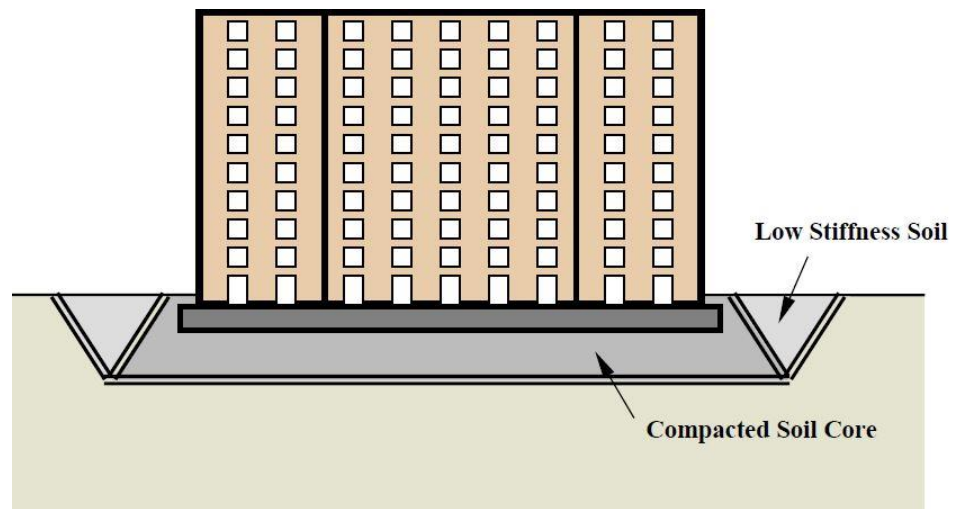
Schematic Drawing of Trapezoidal Shaped Soil Isolation System (Tsang, 2008).
